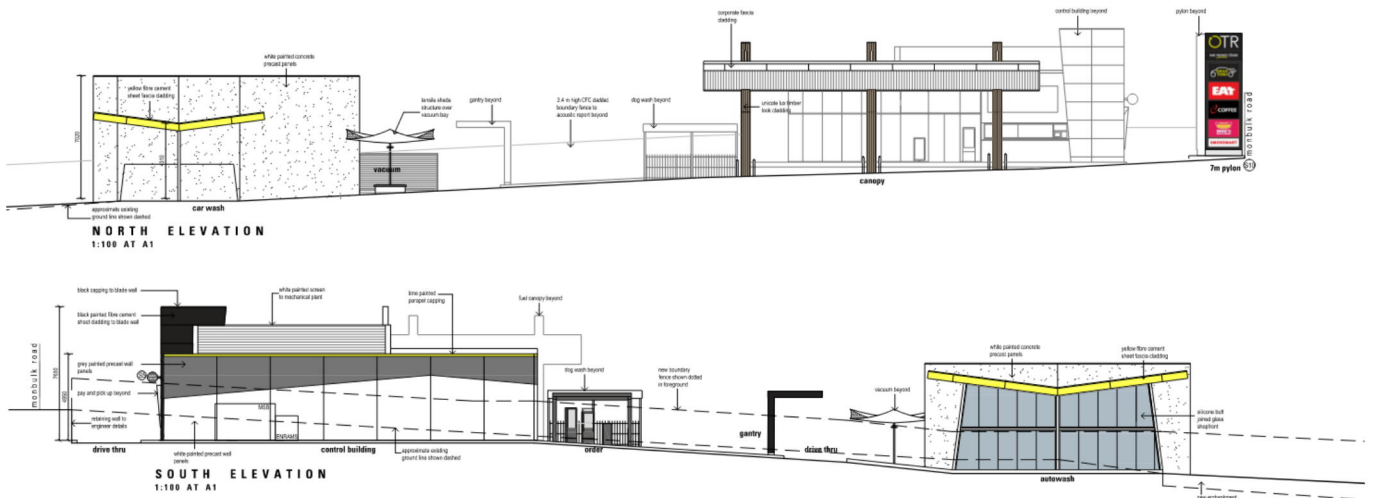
North Elevation abutting adjacent commercial property and South Elevation abutting residential property
